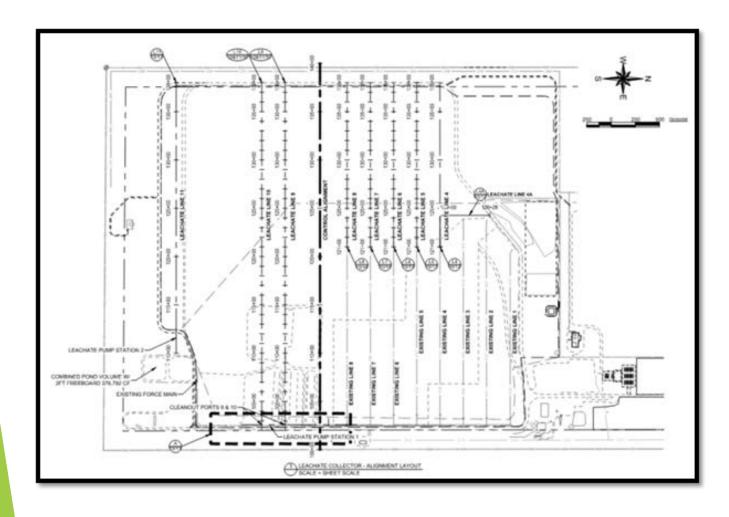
shows the leachate collection system as proposed to IDEQ in the Tentative Design Plan.
